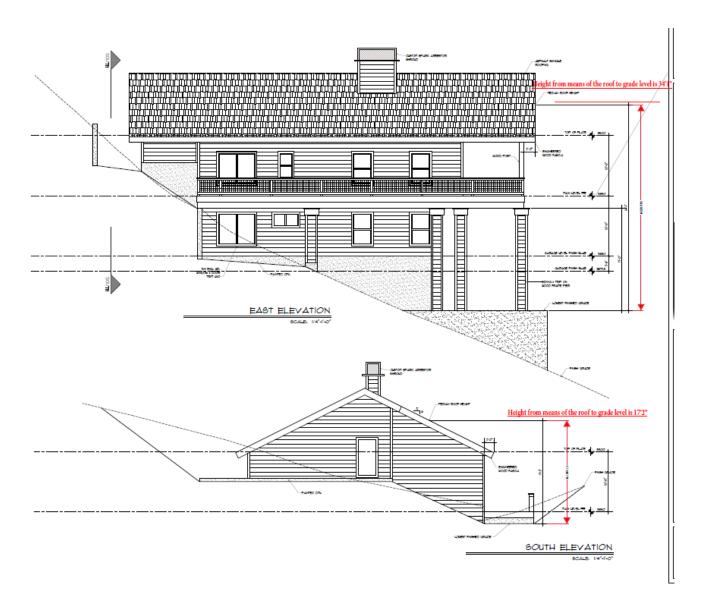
Revised East and South Elevation (reflects Planning and Zoning Commission recommendation)
